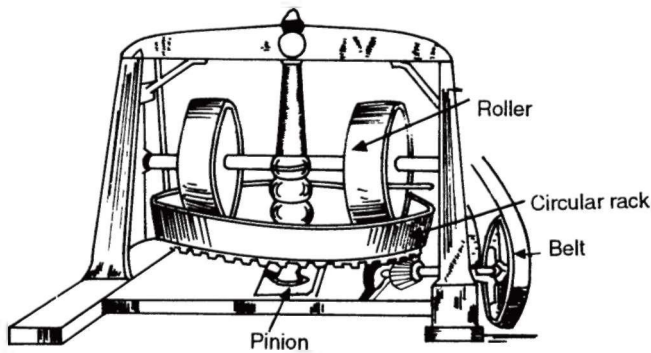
Power Driven Motor Mill (Pan Mill)
